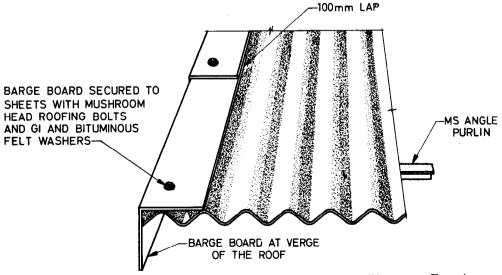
Typical Details of Barge Board or Corner Piece (View from Eaves)
